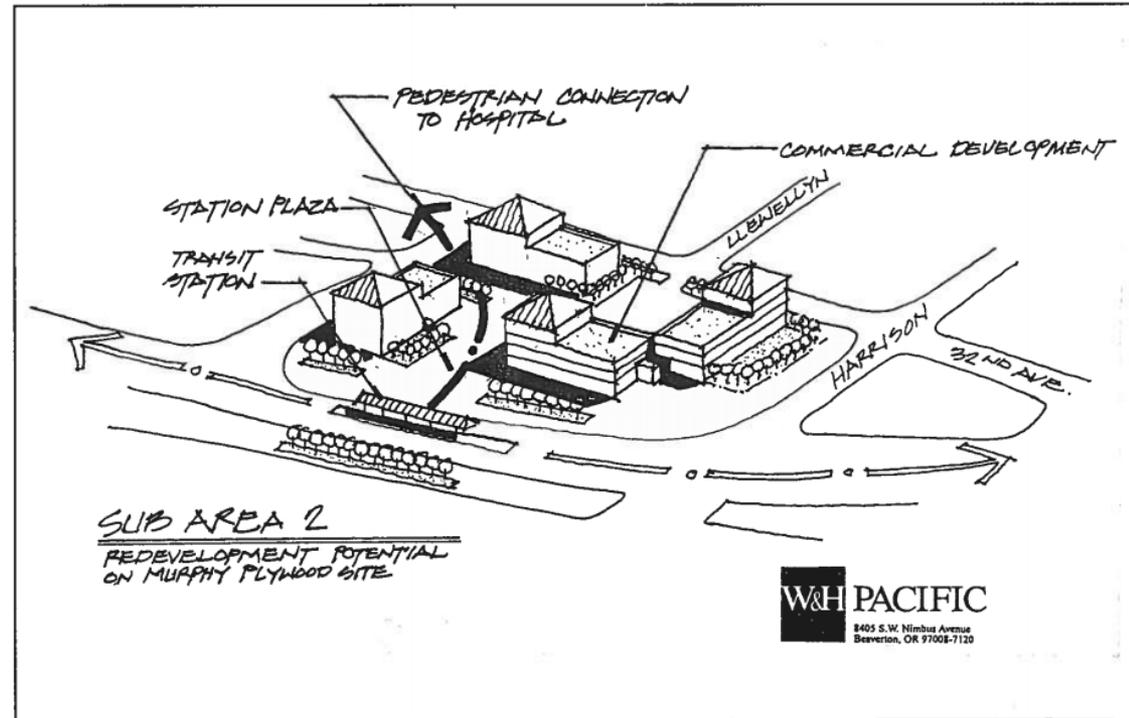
Illustration of Office Building on Subarea 2 Redevelopment Site
